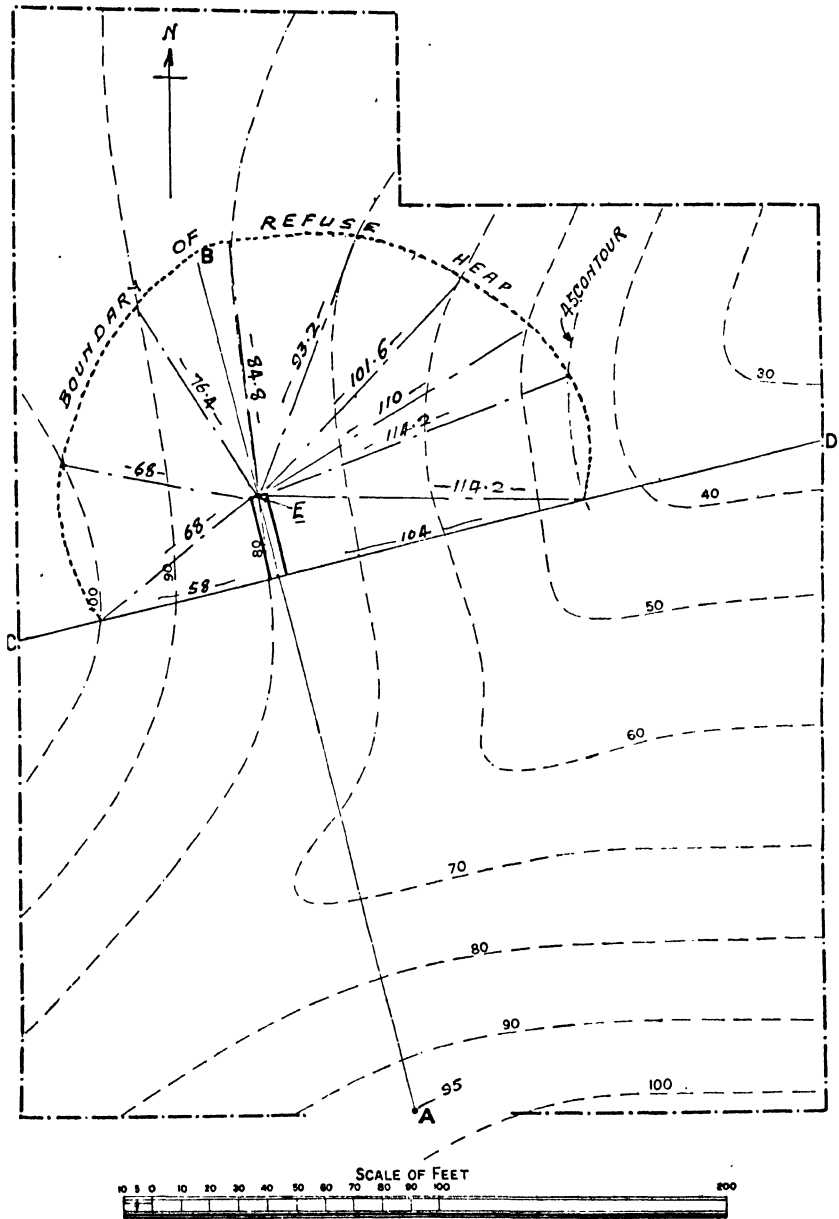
Contour Plan and Boundary of Refuse Heap.
